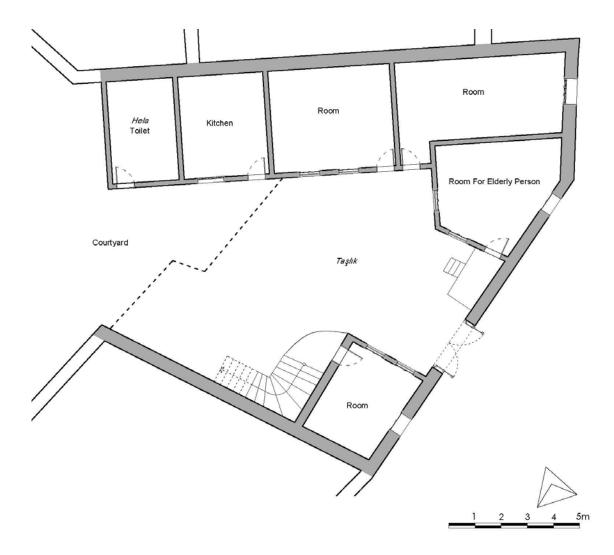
The plan of the ground floor of Zühtü Bey House
